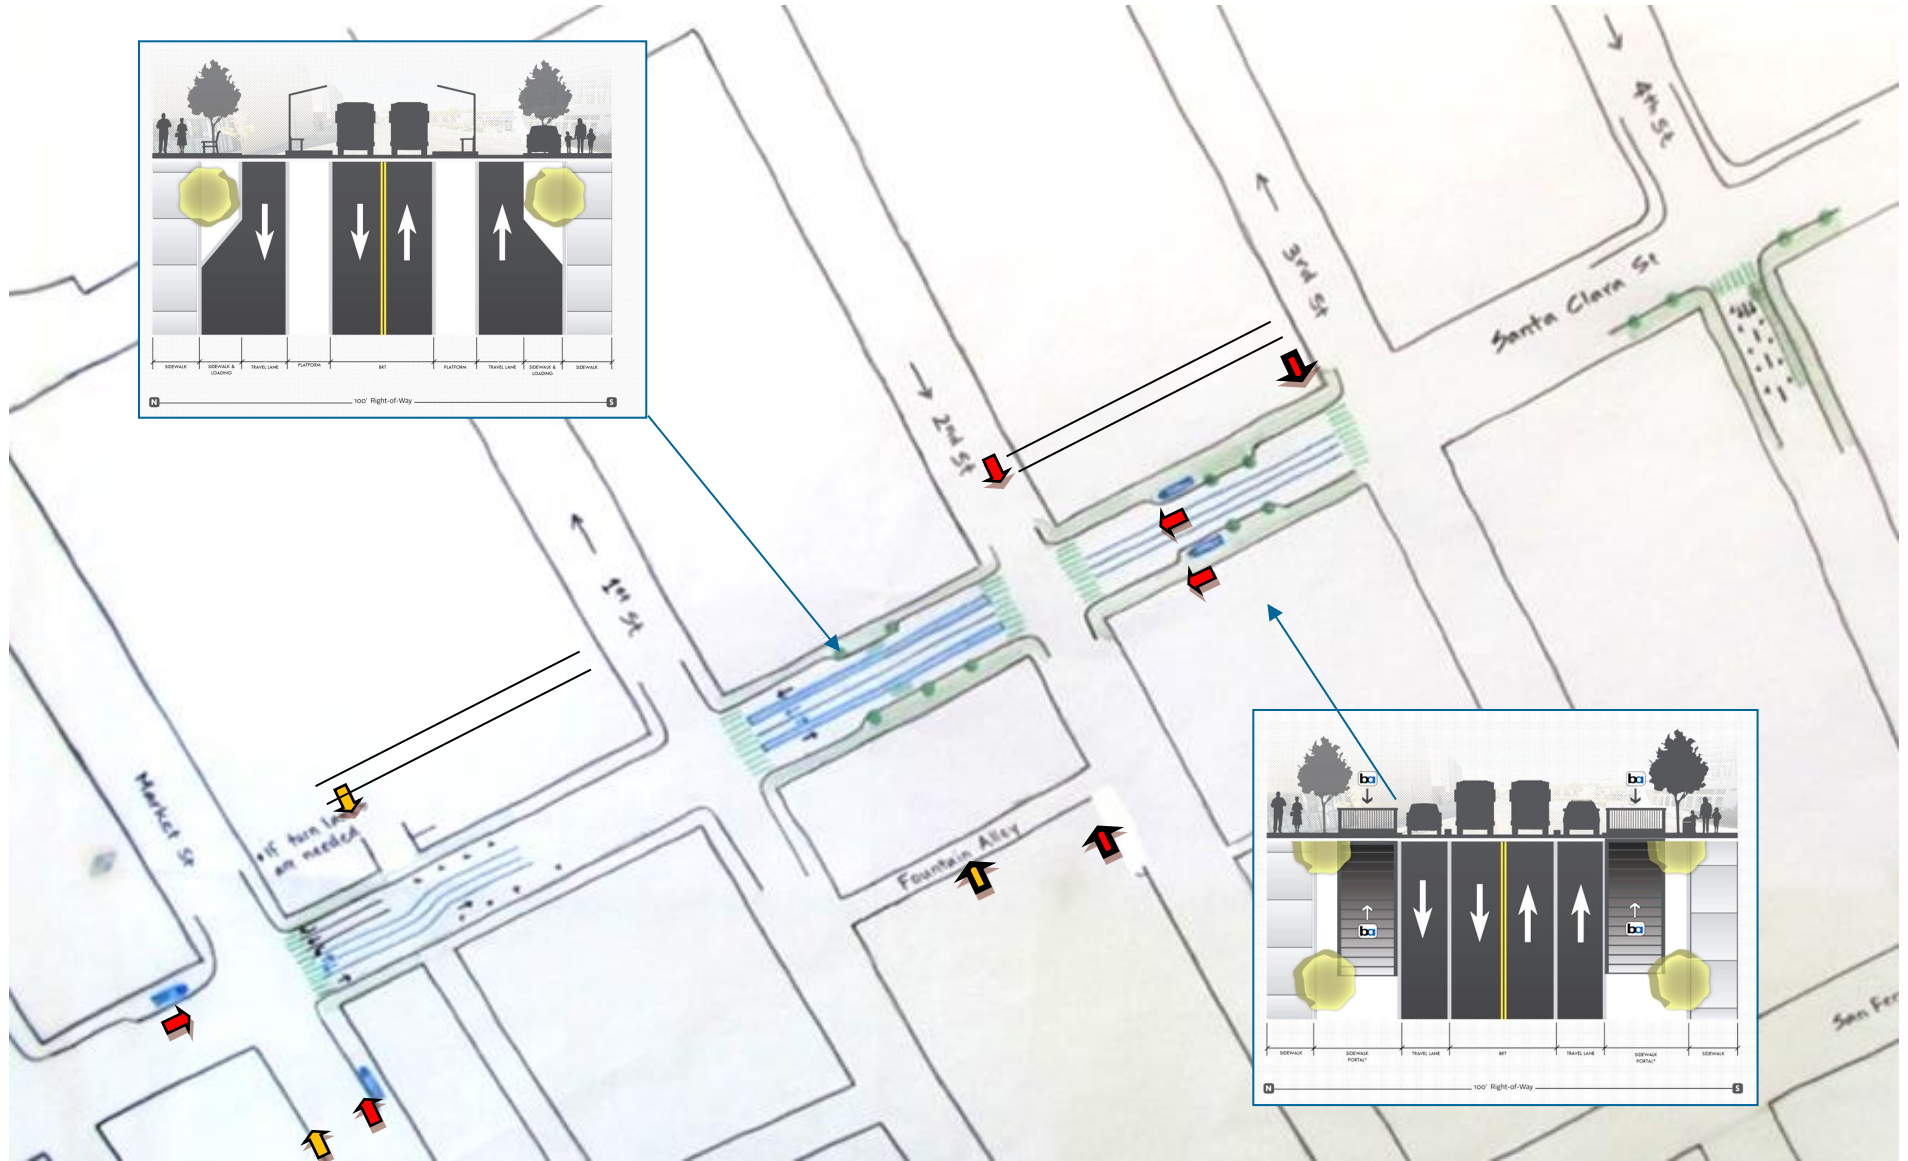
Potential Cross Section for Santa Clara Street between 1<sup>st</sup> and 2<sup>nd</sup> Streets
